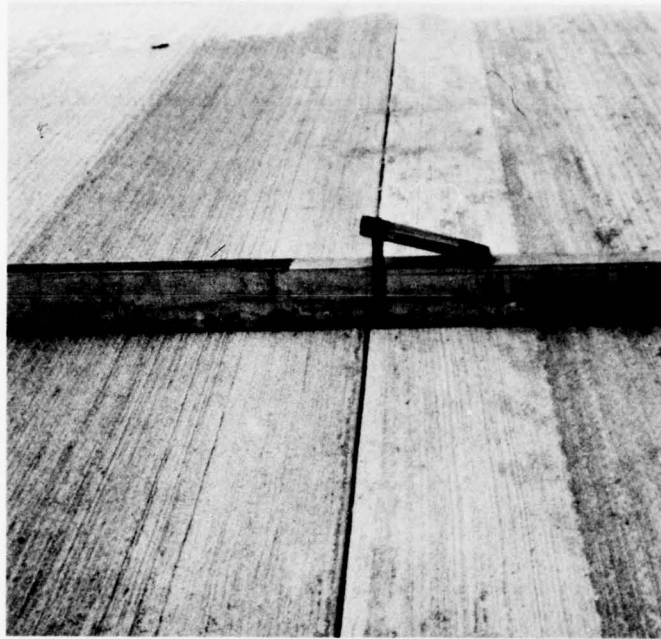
Typical shape along longitudinal construction joints (ridge along fill-in edge)
